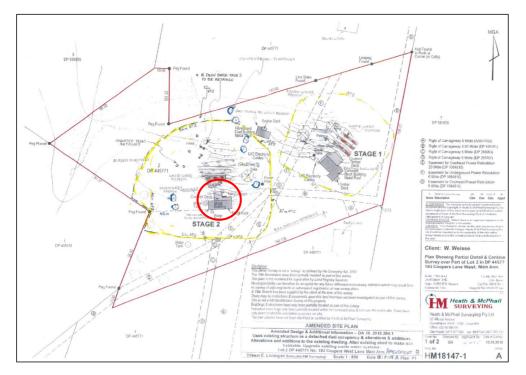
Site plan showing location of existing structure to be converted to a dwelling (red circle). Larger image in Appendix A.
